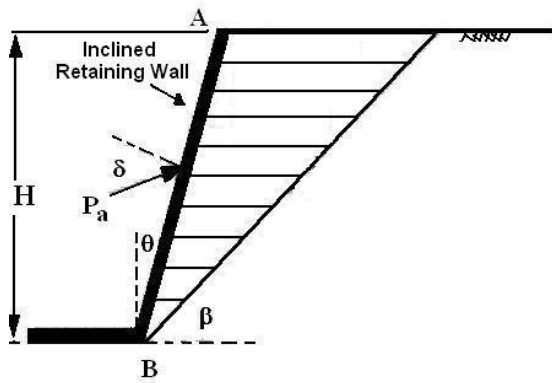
Division of failure wedge into horizontal slices for an inclined retaining wall
